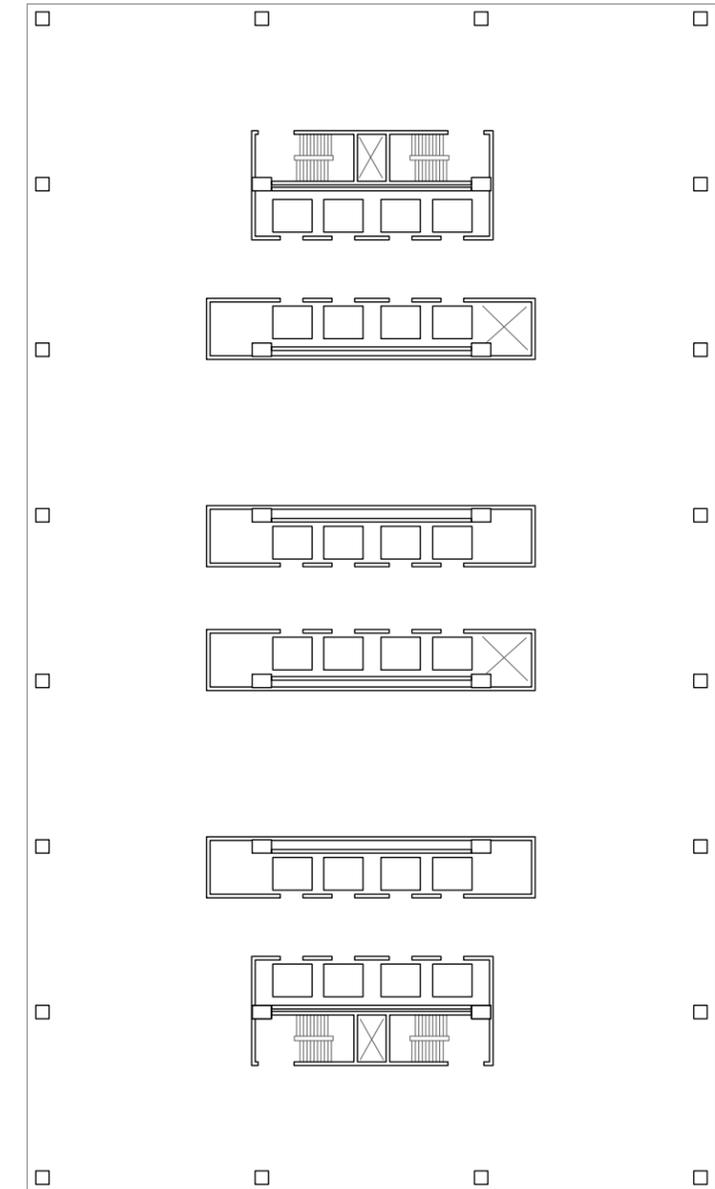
Author. Toronto Dominion Center Floor Plan. 2022.
